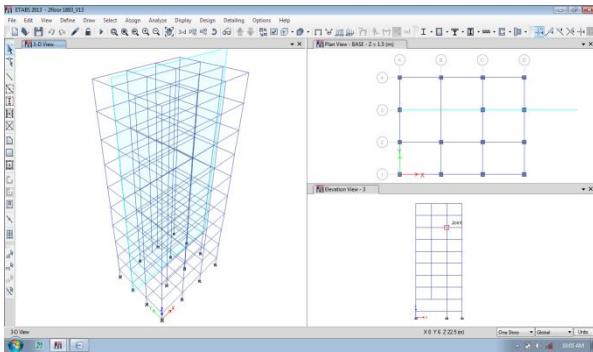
Plan and Elevation of 10 storied irregular frames considered for study
